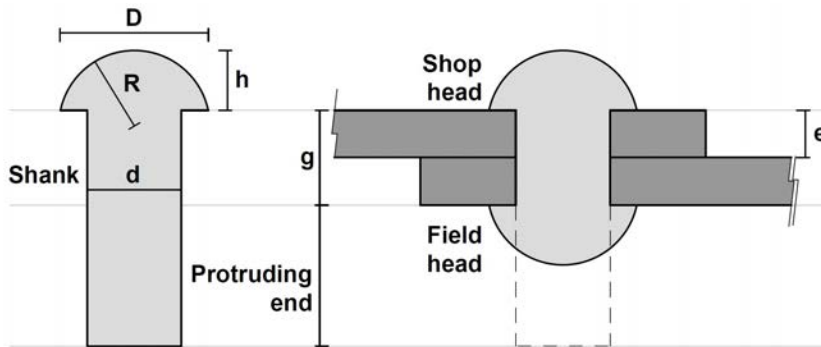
Geometrical parameters defining a riveted connection: rivet shank diameter d , plate thickness e , head diameter D , head depth h , head radius of curvature R and grip length g
